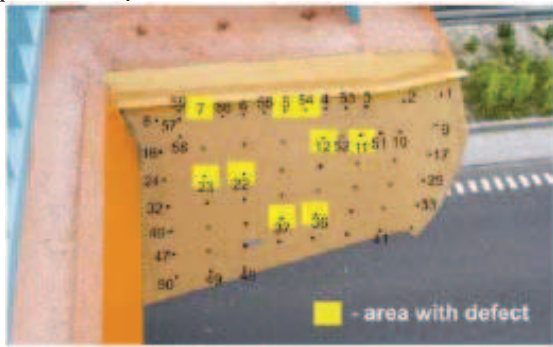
Measurement points for cantilever no. 4 with marked damaged areas
